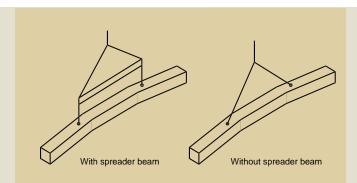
Two lifting schemes are illustrated for lifting curved girders.
